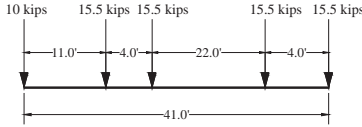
Proposed New York State Legal Trucks for bridge rating.
